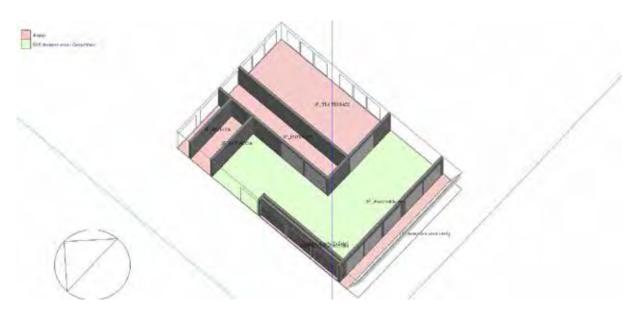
c Ground Floor thermal zones and building openings in Design Builder
